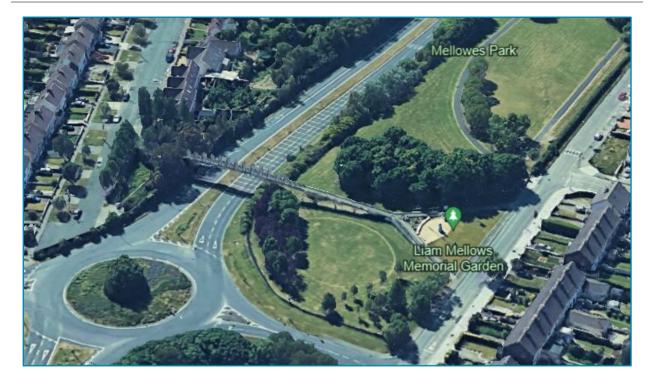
Plan of Footbridge to be demolished south of R135/R104 Junction (looking southwards)
